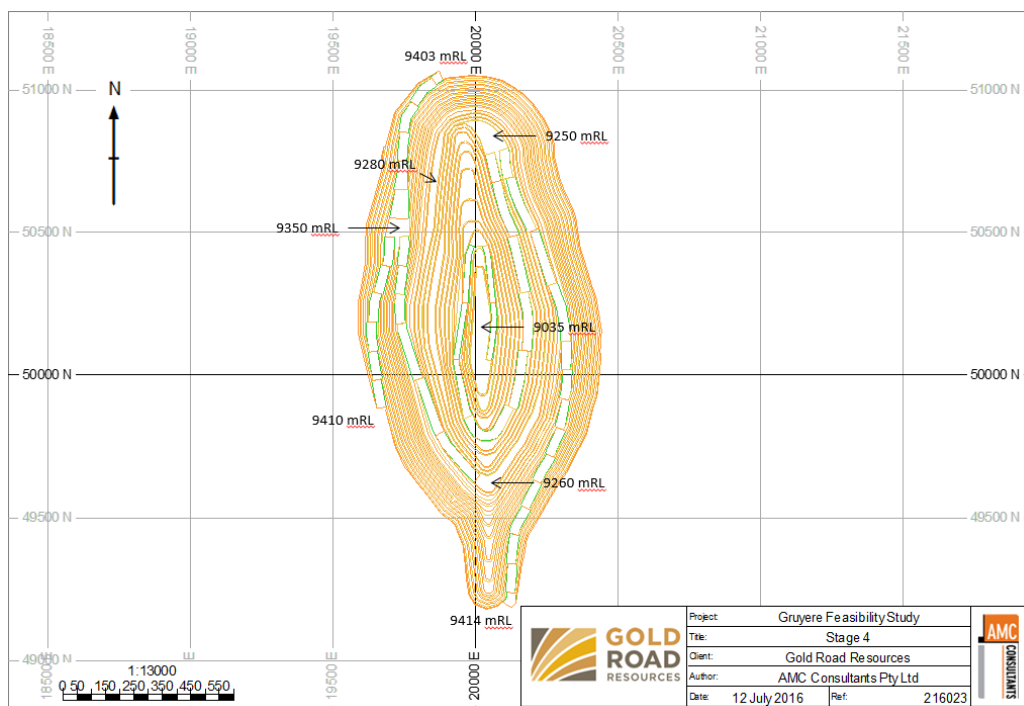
Plan view showing Stage 4 which will be the Final Pit Design
